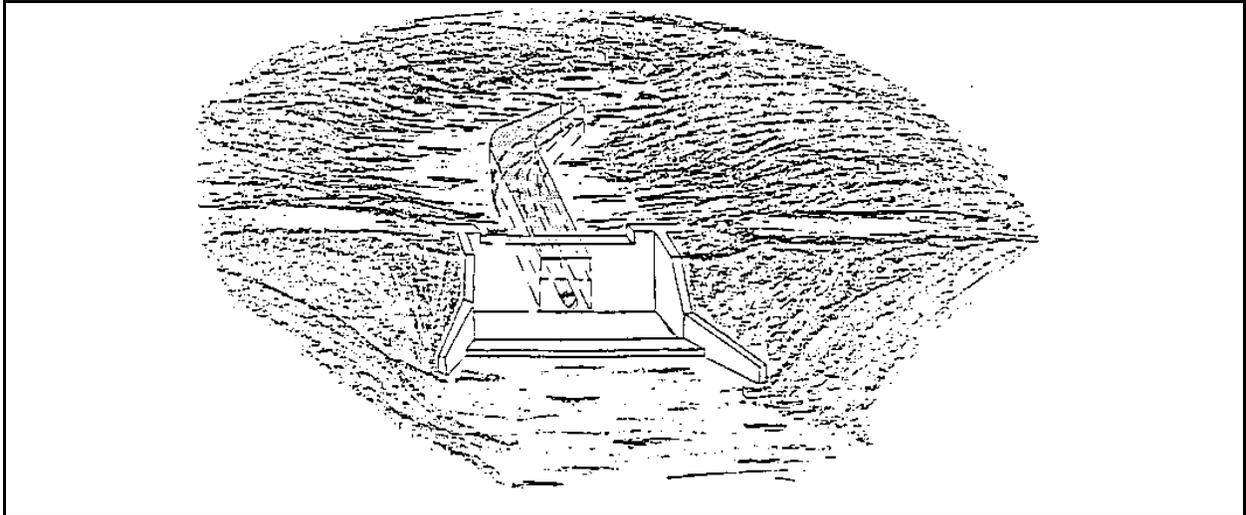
Illustration of Bottom Filter or Underdrain System used in Conjunction with Rectangular Weir and Drop Spillway
